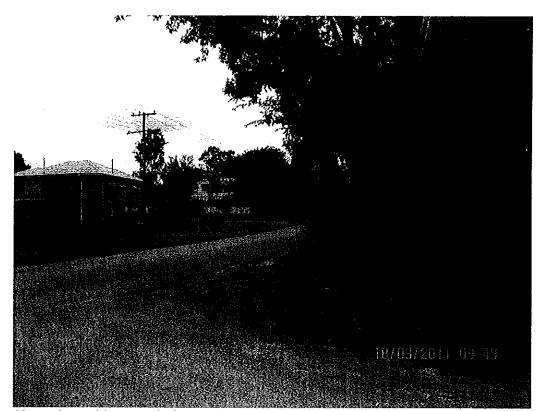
Looking south from access on Clematis Street showing sub-standard sight distance.
